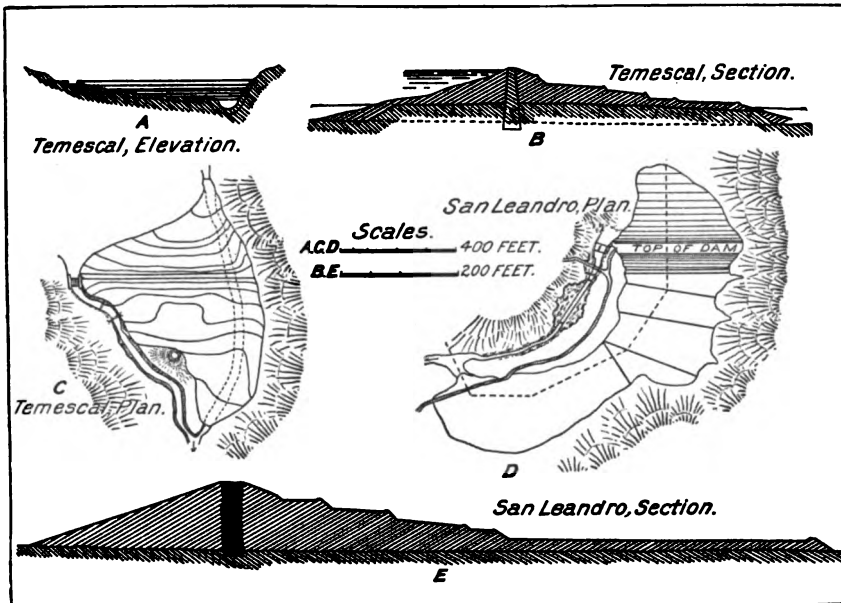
PLANS AND CROSS-SECTIONS OF SAN LEANDRO AND TEMESCAL DAMS.
